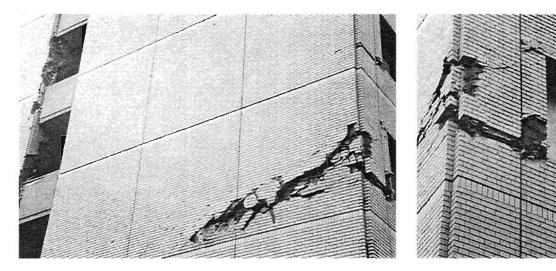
Flexural/shear failure in shear wall building
